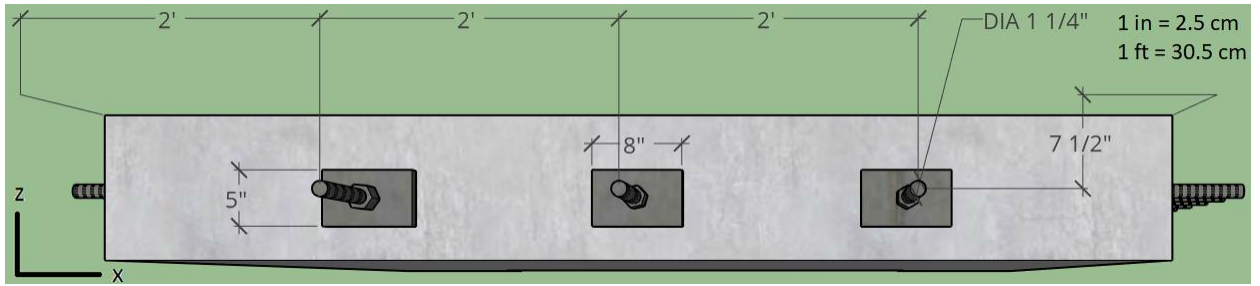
Specimen 1- Post-Tension Bar Layout Top View
